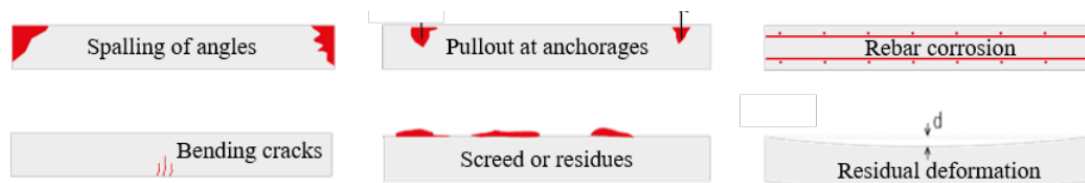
Common types of damage to concrete elements. (Devènes, Bastien-Masse, Widmer, et al., 2023)
